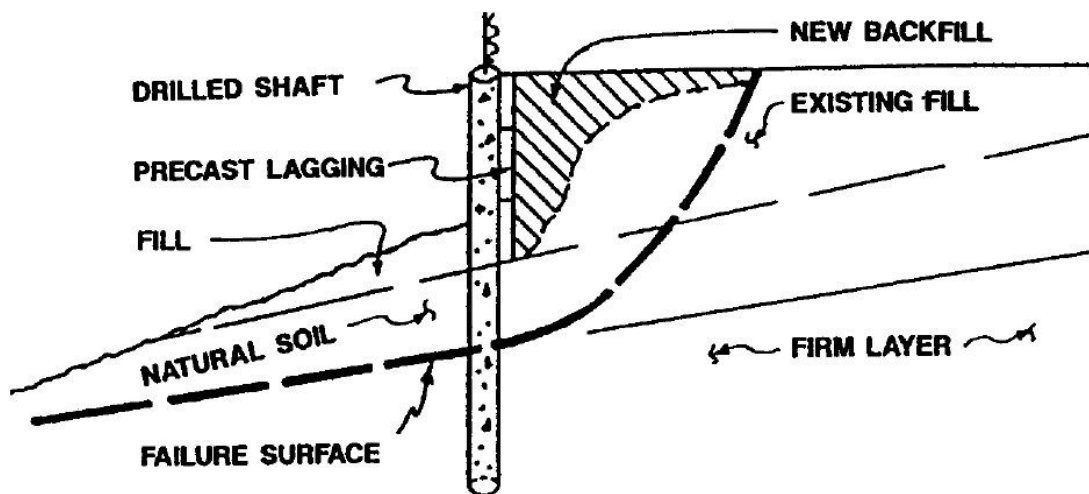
Drilled shaft wall stabilized slope (Abramson et al., 2002).
